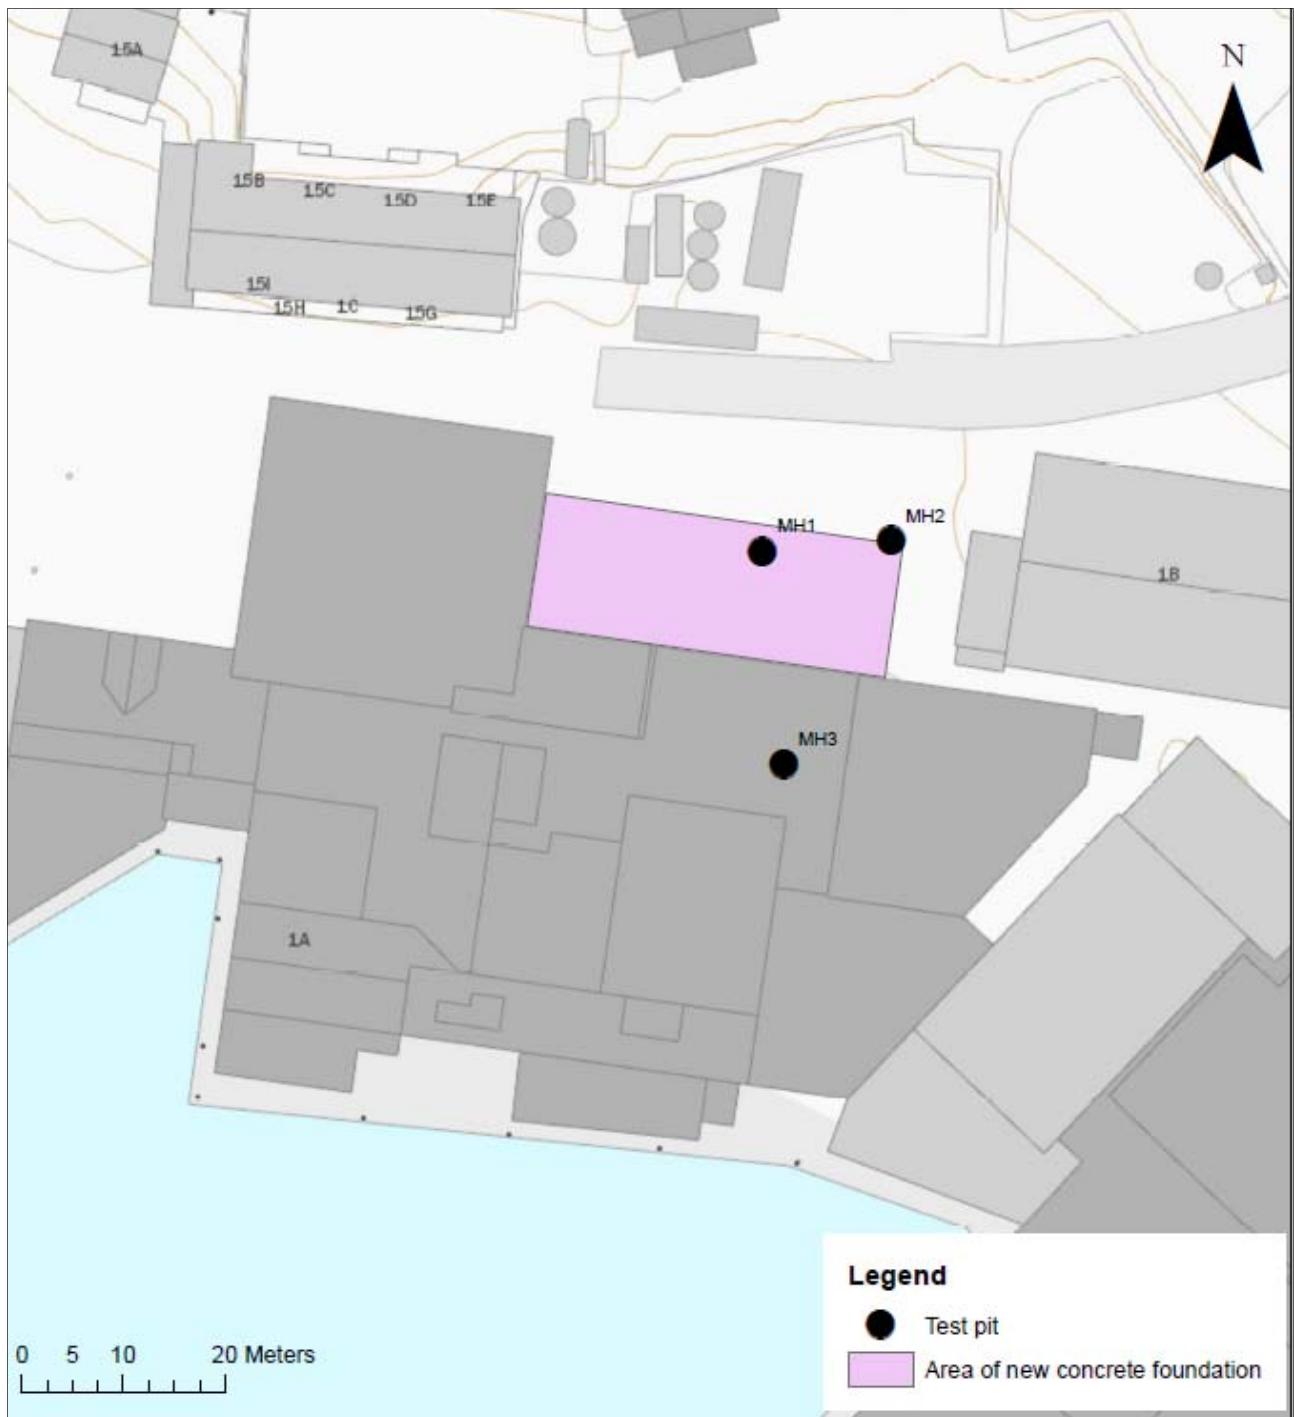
Test pit locations (MH1-MH3). The pink area is where the new concrete foundation is planned.
